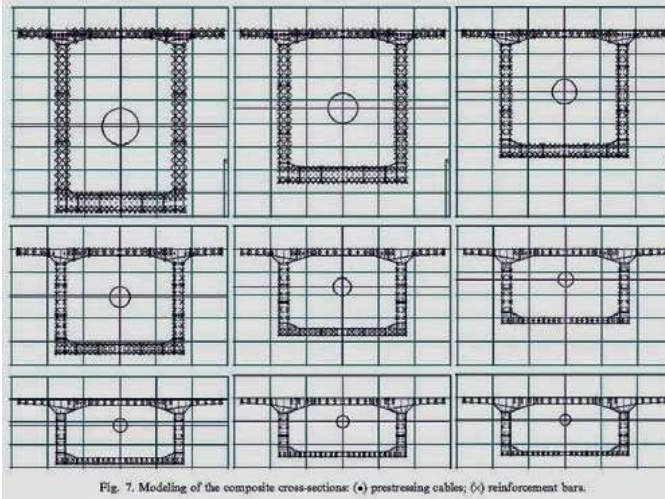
Modeling of the composite cross-sections: (*) prestressing cables; (#) reinforcement bars.
